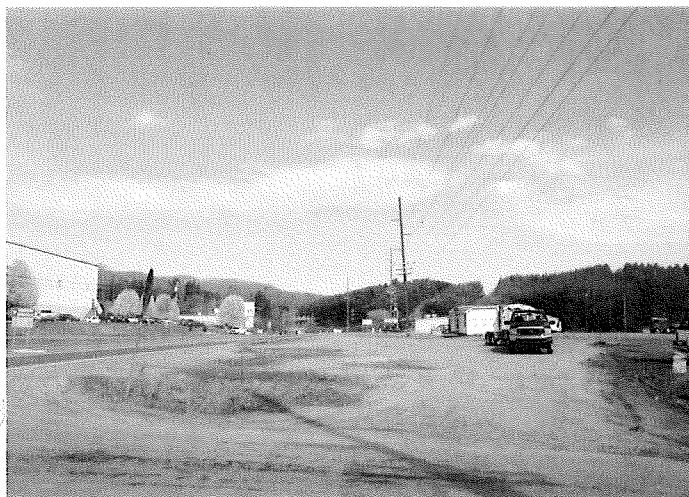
Looking southeast at proposed drainage piping area. Note geoprobe (GP-1) location.
